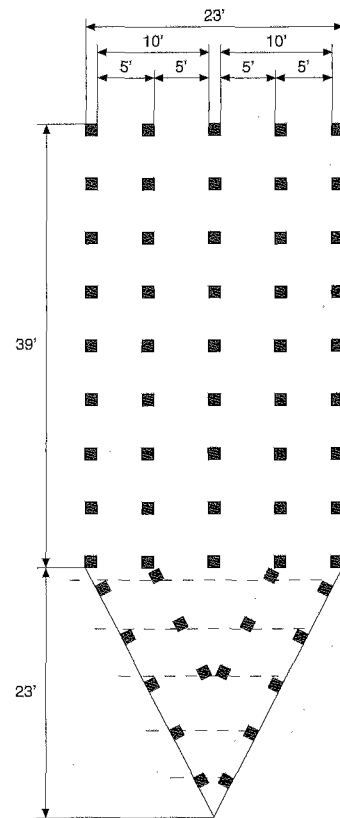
Reconstructed pile-driving plan of pile group 2000 with measurements in Roman feet.
